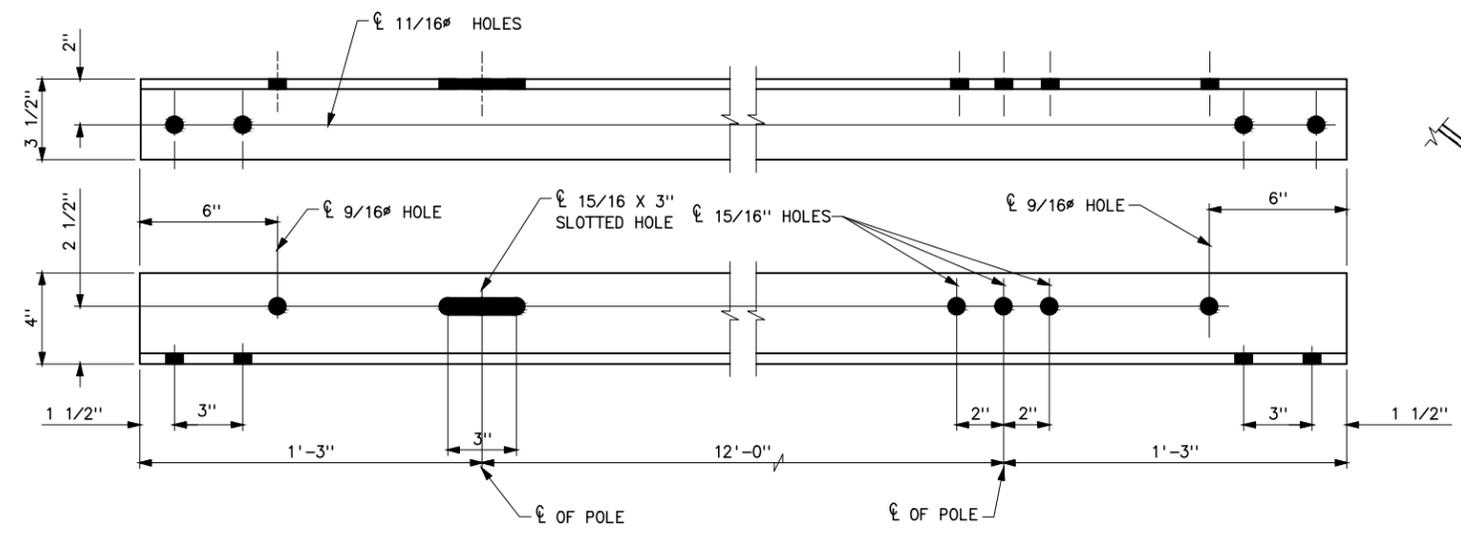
DETAIL OF OVERHEAD GROUND WIRE SUSPENSION ATTACHMENT
